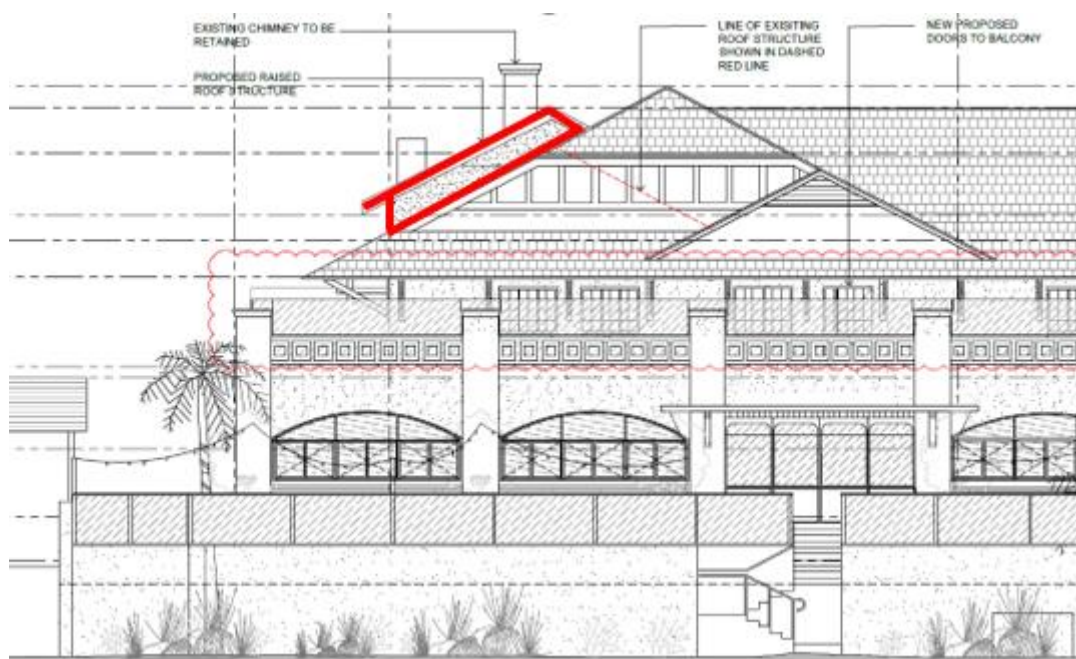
Plan extract northern elevation showing the height non-compliance based on ground level (existing). The red line shows the extent of proposed new works located above the height standard as viewed from this elevation.
